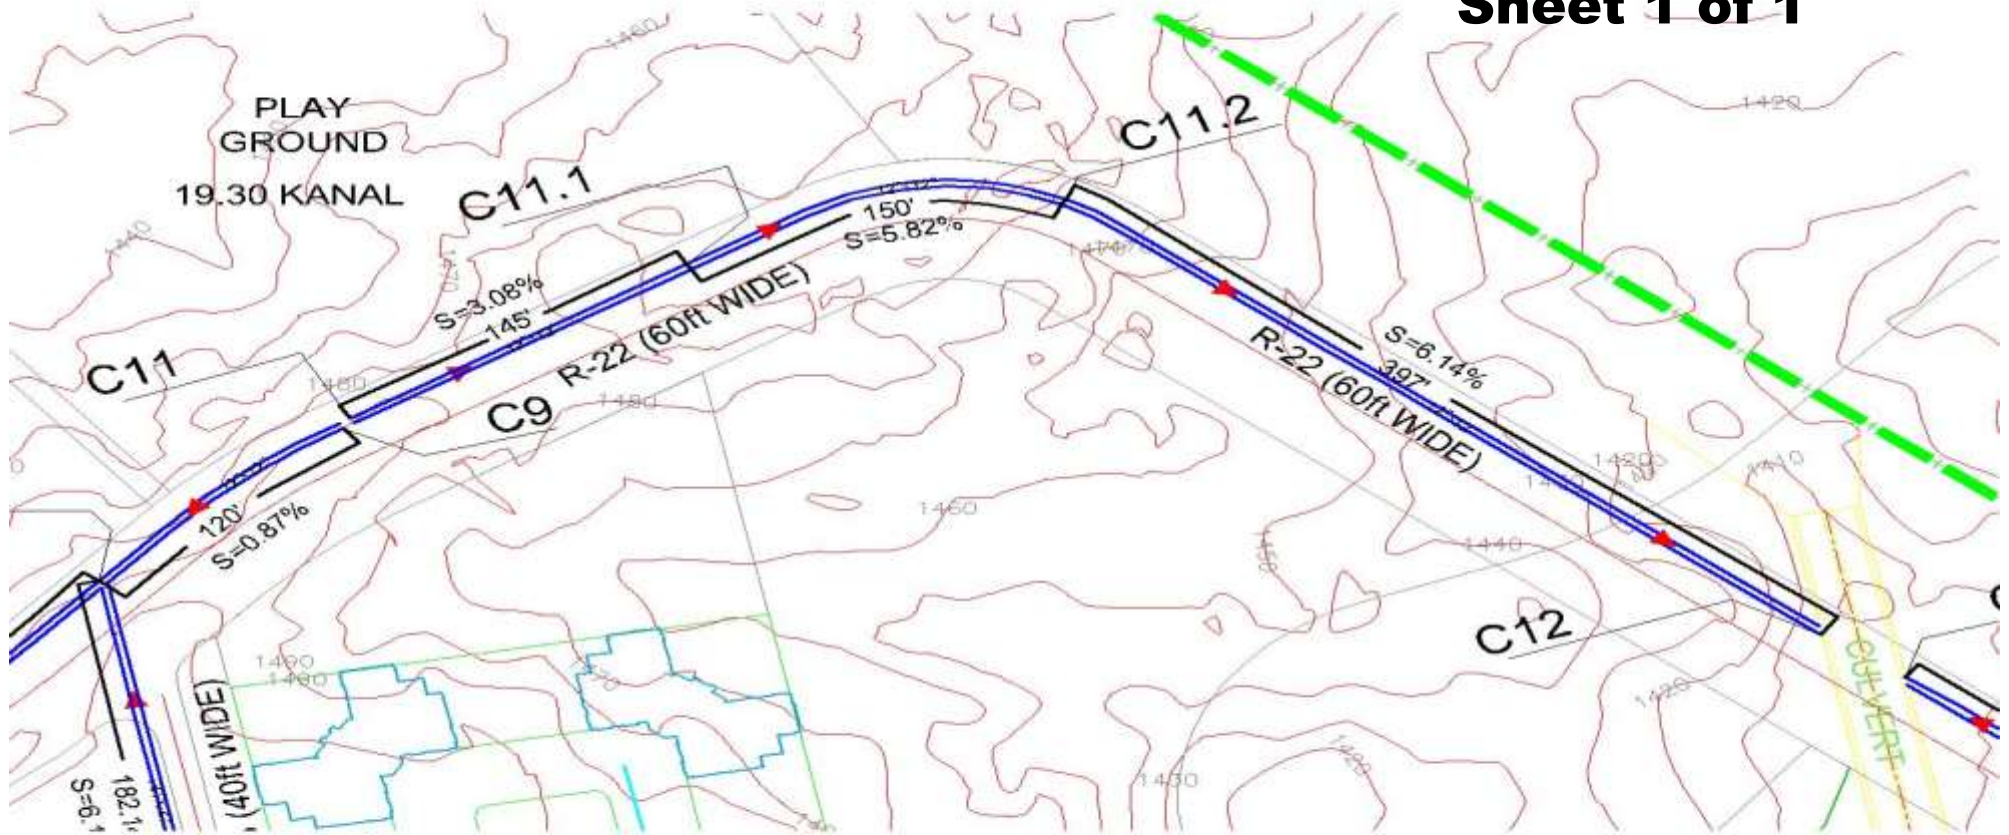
Storm drainage layout plan of Sub-catchment-14 showing final disposal node C124
